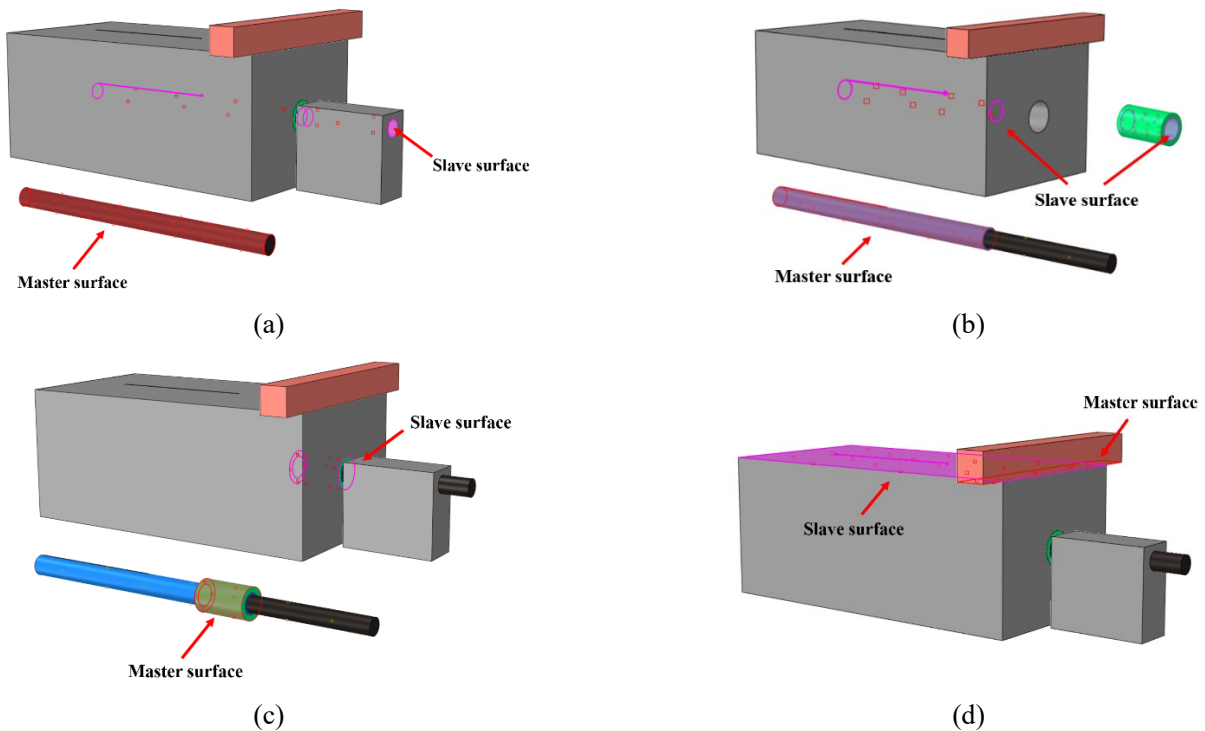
Contact surface assignments in finite element model (a) dowel to tube and dowel to fixing device, (b) tube to ring and tube to concrete, (c) ring to concrete, (d) loading block to concrete block.
